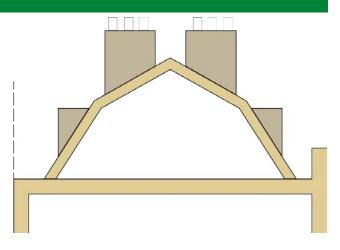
A double pitch mansard roof should have four slopes, the lower face should be steeply pitched and the upper slope should have a more shallow pitch. We would expect this traditional style Mansard within Conservation Areas where appropriate
